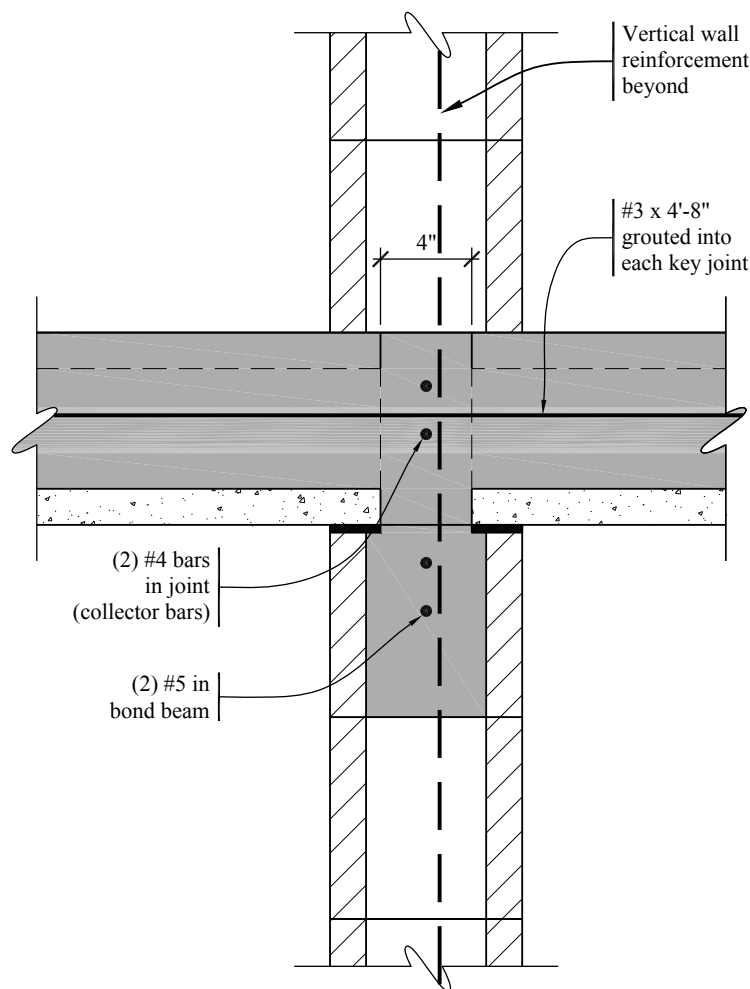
Wall-to-diaphragm reinforcement along interior longitudinal walls - Joint 5
